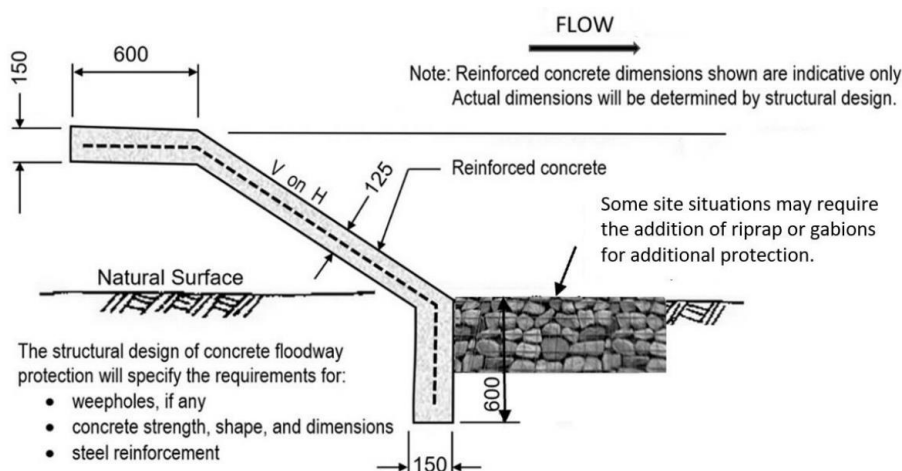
Type 1 floodway crossing protection – RC margin, batter and apron
